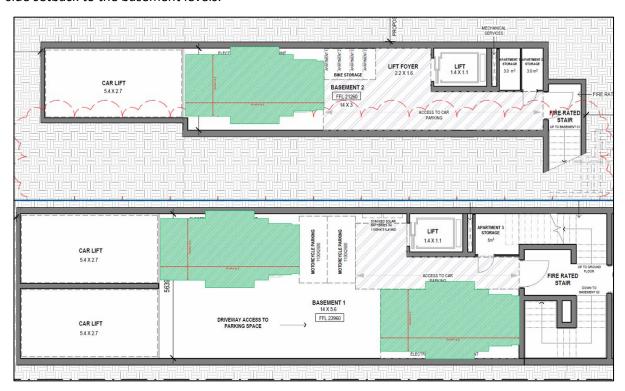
Figure 5.2 of AS2890.1 overlaid on the proposed plans, demonstrating a slightly larger basement width.
